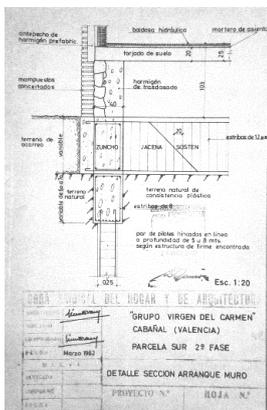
Constructive section and plan with finishing technical specifications, original Project. 1962
